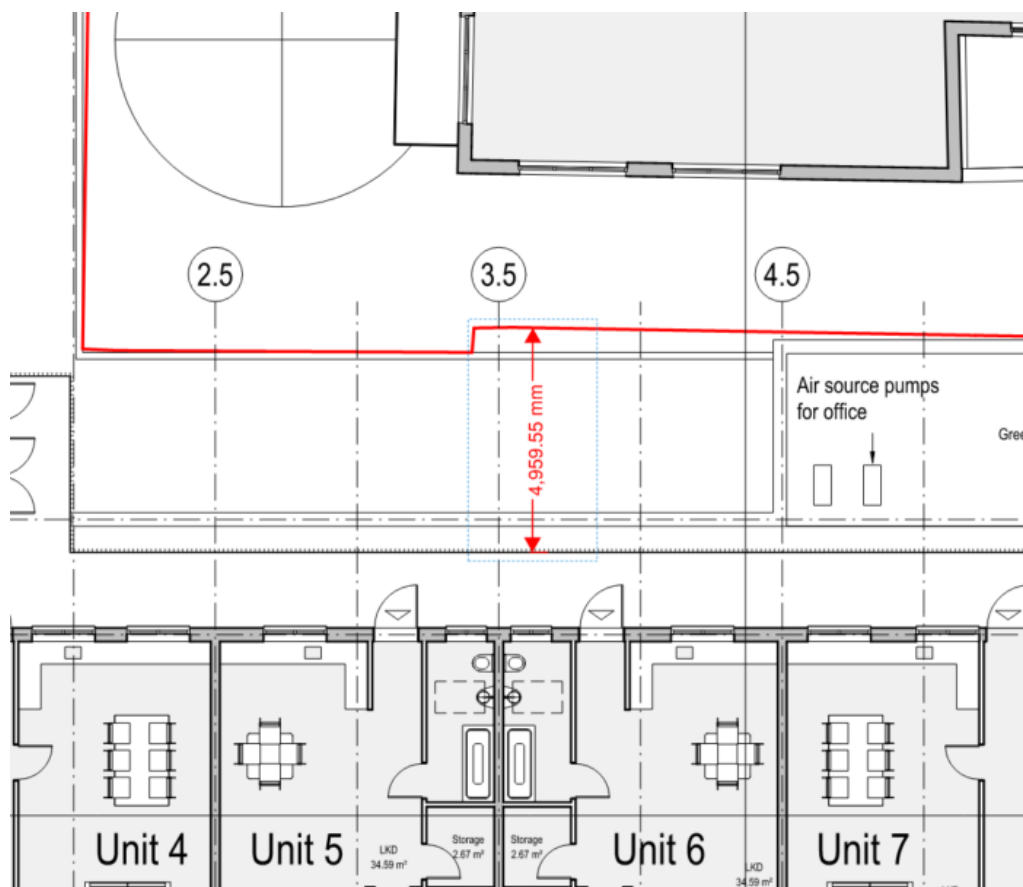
Inset of First Floor plan showing separation distance from the deck access balustrade to Wellesley Road Care Home
